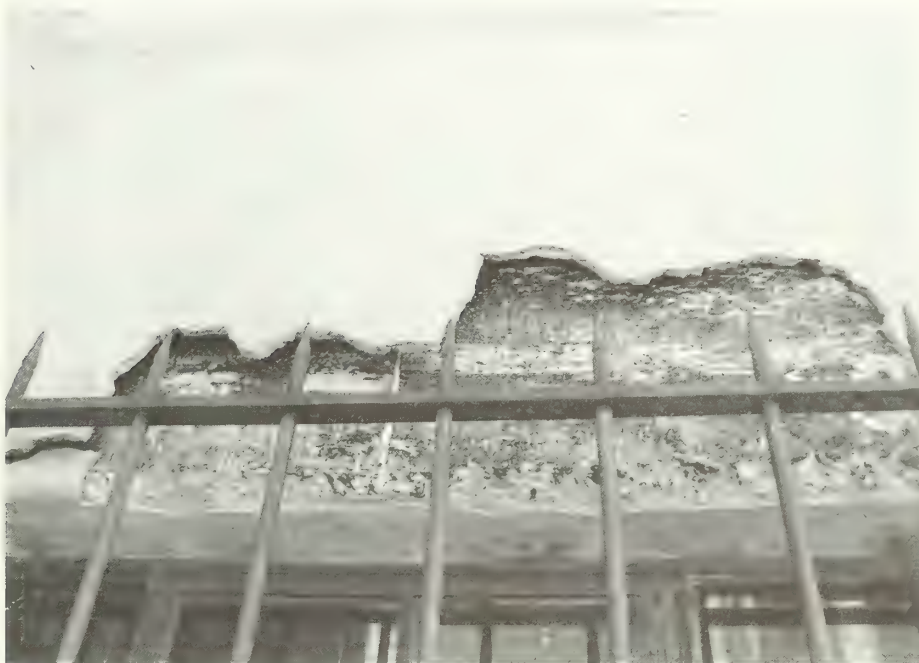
Annex north wall, detail of window head. Note asphalt coated concrete substrate where stucco has fallen off.
